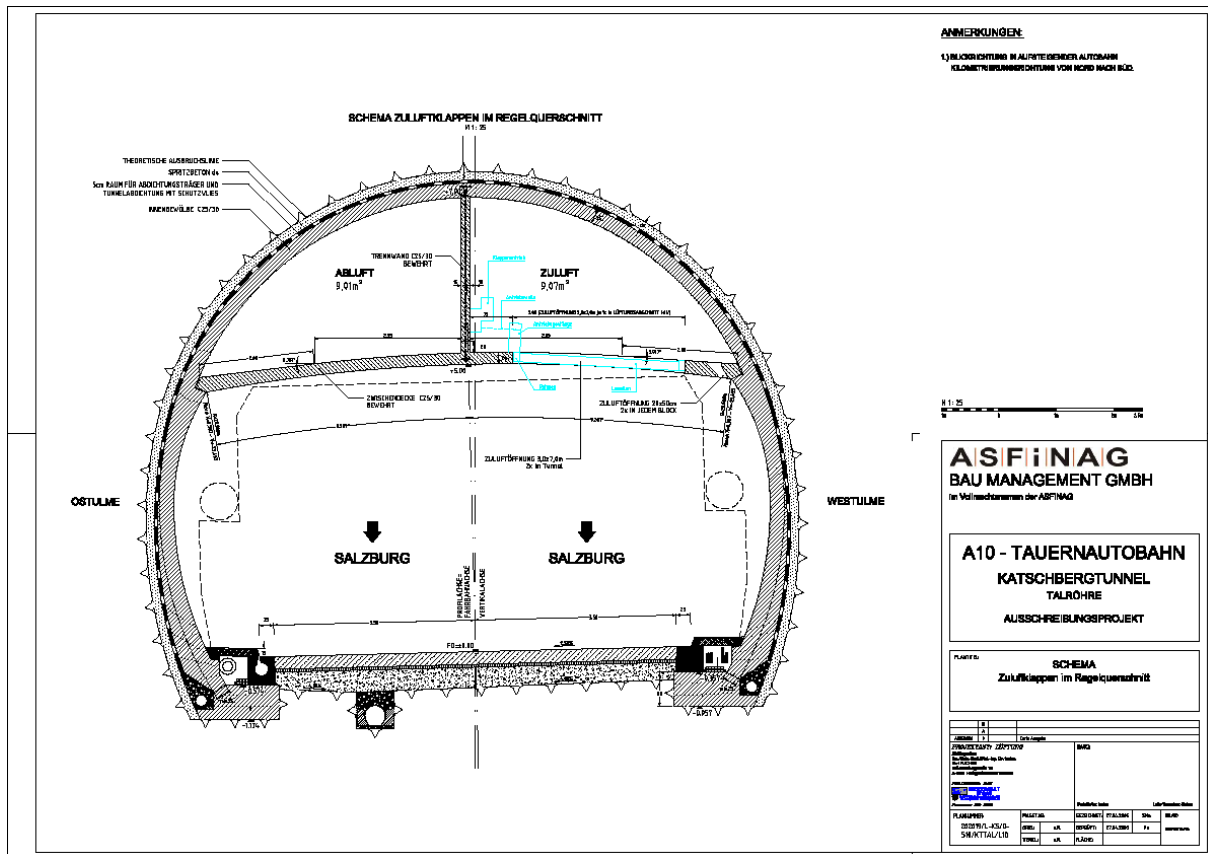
Cross section of the Katschbergtunnel with a fresh air damper
